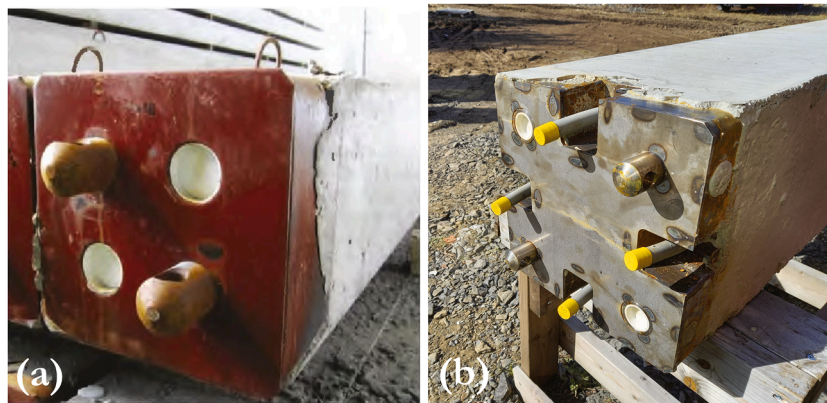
(a) regular joints for driven precast concrete piles [6], (b) DEP joint.
